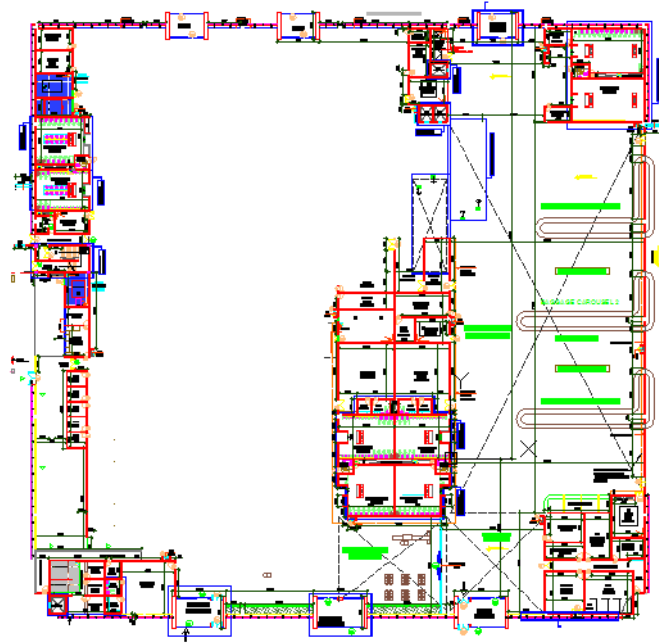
Typical plan Layout of Baggage Claim Areas
